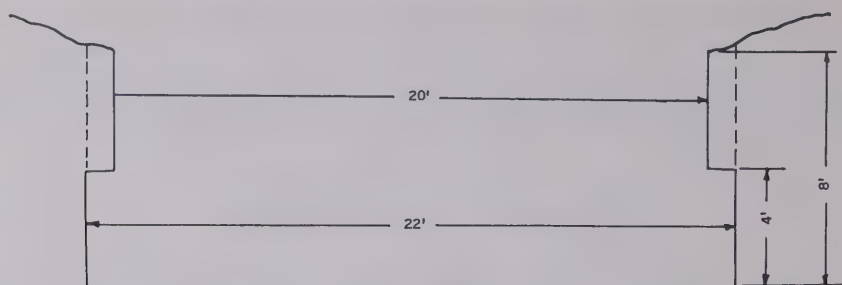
Undercutting of trench walls to provide space for walkway and shelters.
